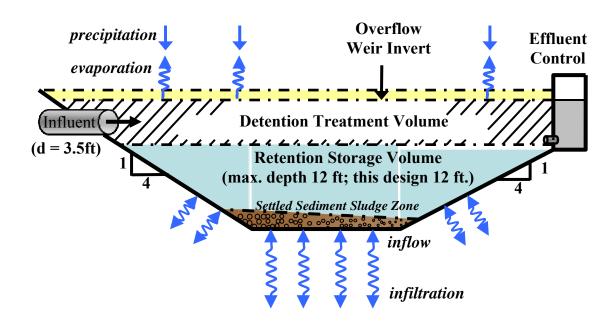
G.2-1 Longitudinal Section of SJRWMD Pond. (NOT TO SCALE)
